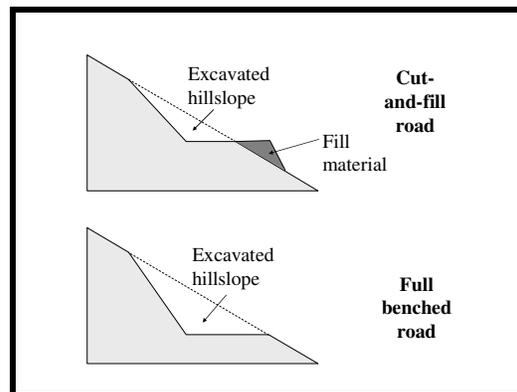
Schematic showing how different road designs affect slope stability. (a) A cut-and-fill road attempts to balance the amount of excavation with the amount of fill necessary to create the desired road width. (b) A full benched road requires more extensive excavation and a higher cutslope, but the excavated material is removed rather than being placed on the hillslope.
